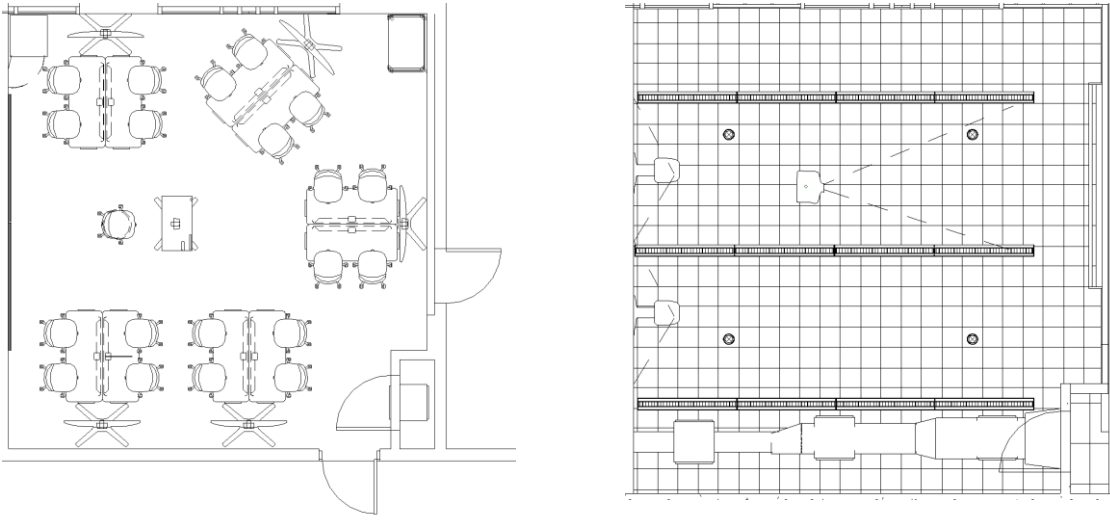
Floor Plan for active learning setup with Reflected Ceiling Plan
